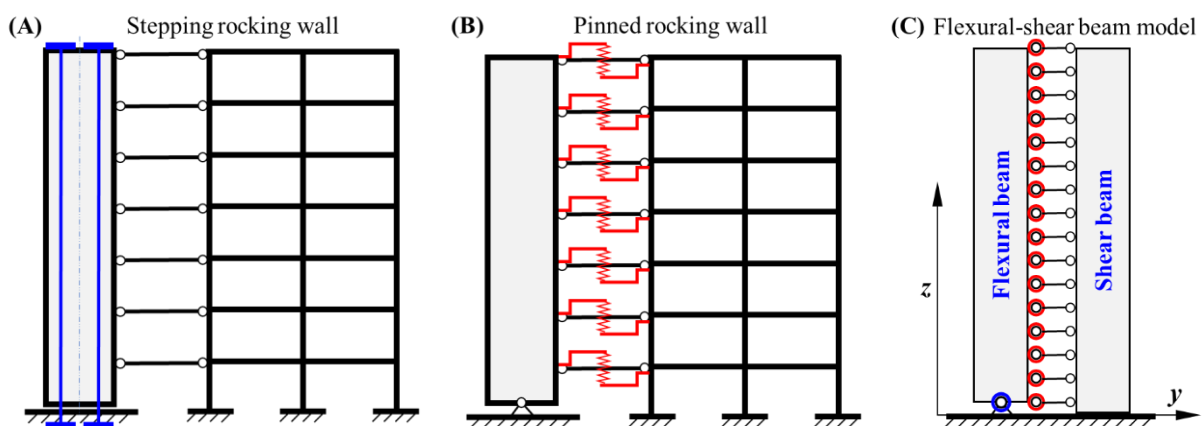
Rocking wall-frame structure: (A) stepping rocking wall & precast tendons (B) pinned rocking wall & dampers (C) flexural-shear beam model with concentrated and distributed constraints
